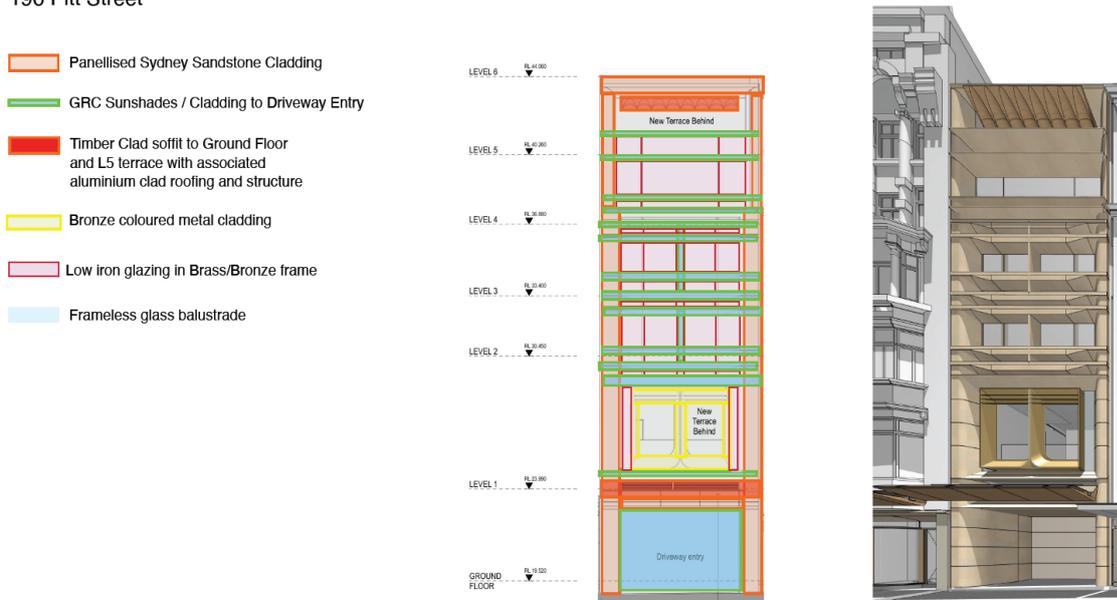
Extract of proposed materials and finishes details to the infill building at 196 Pitt St
